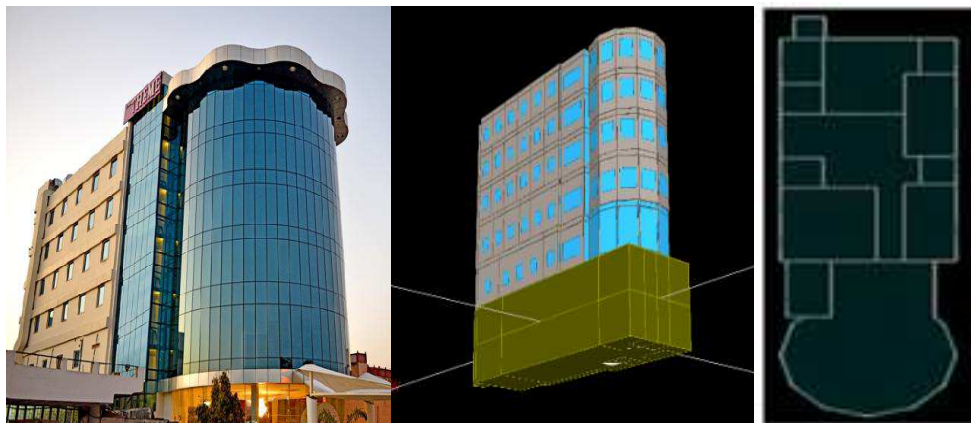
Category-2 Hotel-2 building (a) simulation model (b) and typical floor plan (c)
